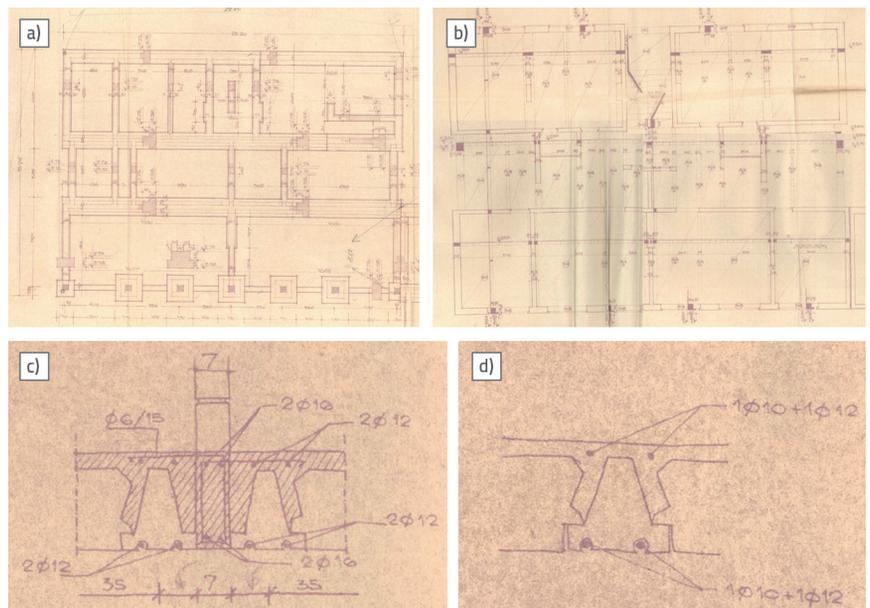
Archive drawings: a) Footing drawing; b) Characteristic floor formwork drawing; c) Reinforcement detail of beam beneath non-bearing wall; d) Reinforcement detail of pre-made floor beams
